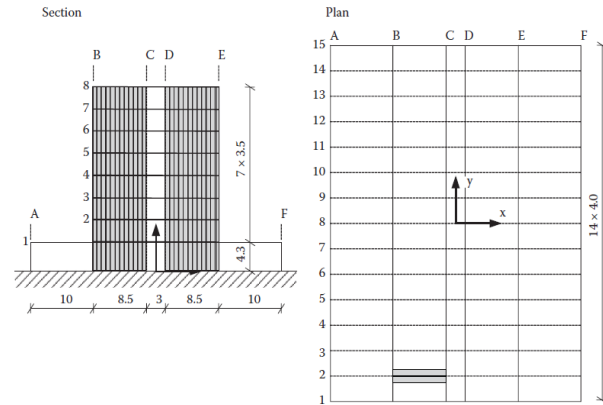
Building layout based on 8 storeys. Ref.: Málaga-Chuquitaype & Elghazouli [6].
